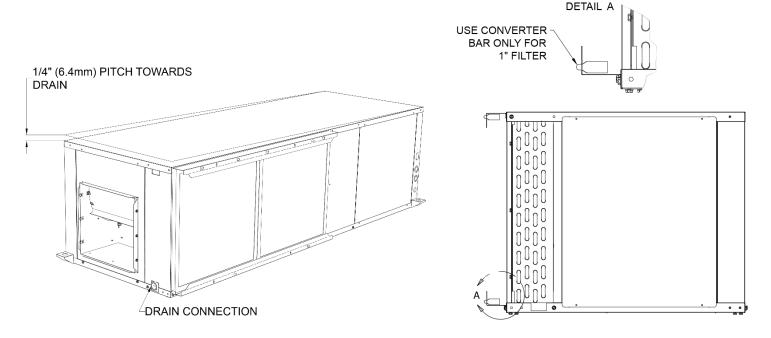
Horizontal Unit Pitch & Filter Rail Detail
